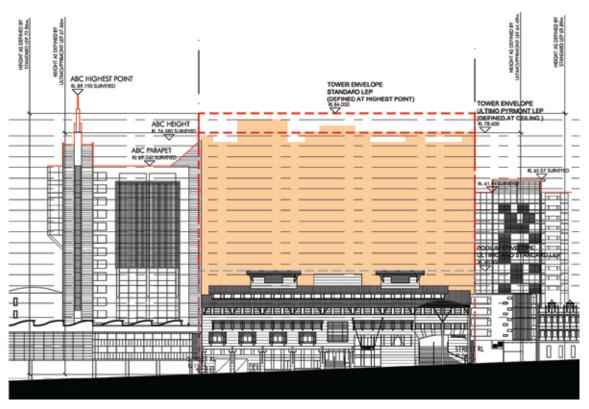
Peter Johnson Building in relation to adjoining buildings (Source: NT)
